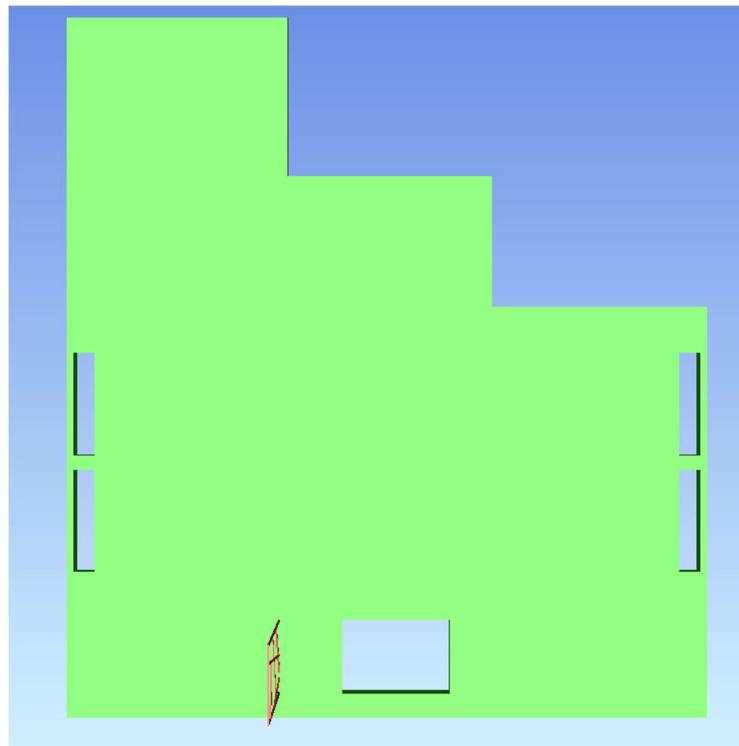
Low Clash of Curtain-wall steel frame (Element ID 30027) vs Concrete slab (Element ID 41112) – Bottom View
